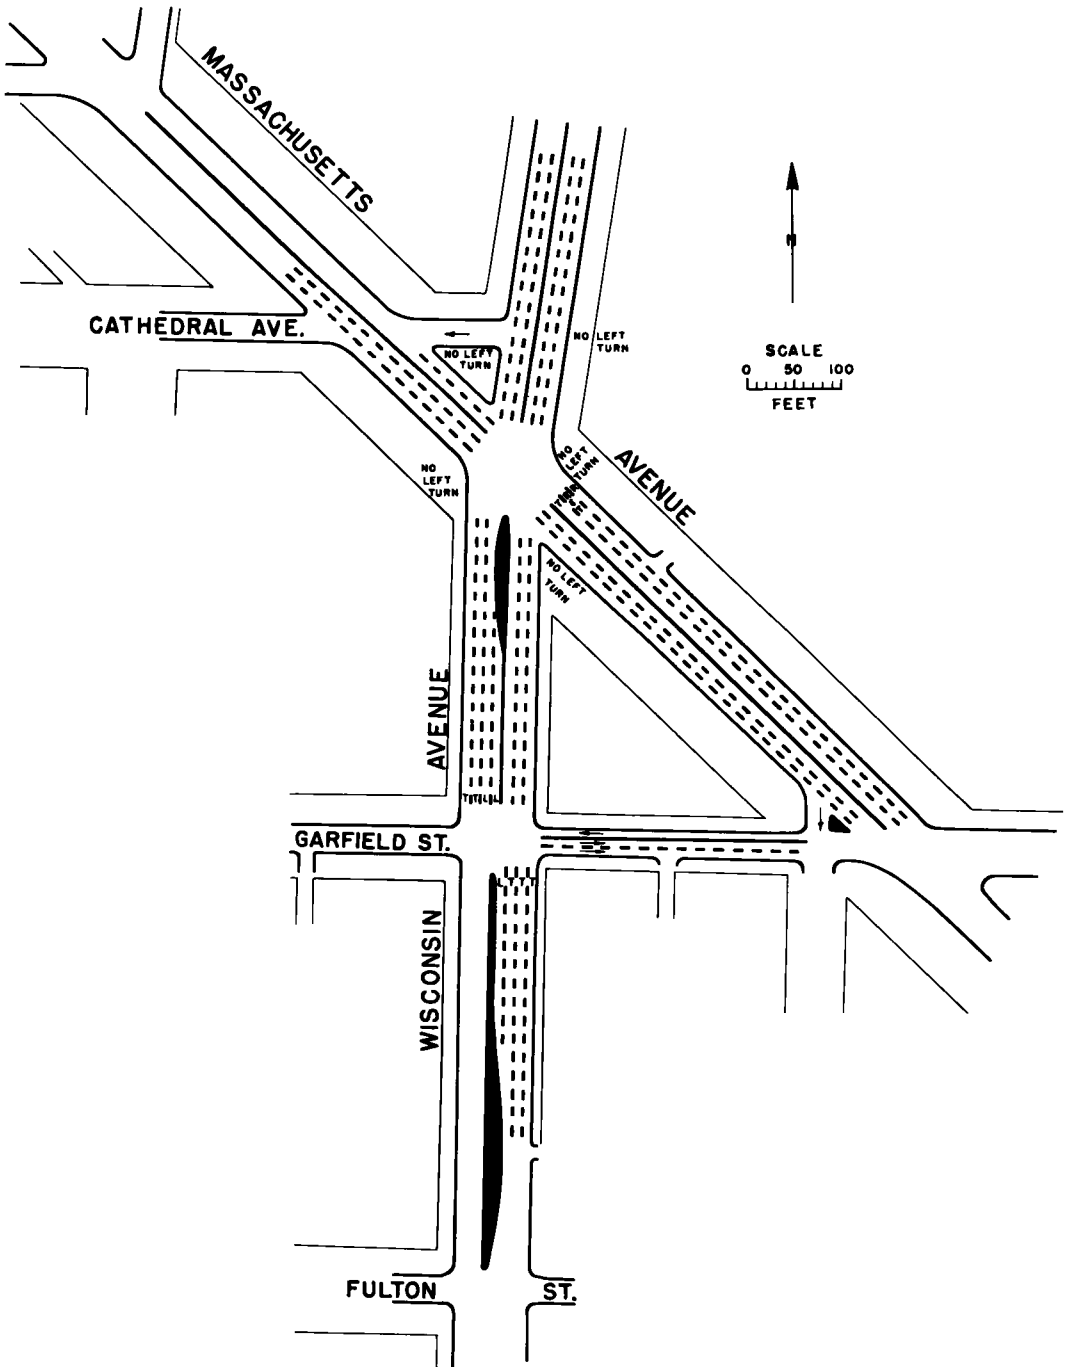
Proposed improvements (Massachusetts Ave.-Garfield St.).
